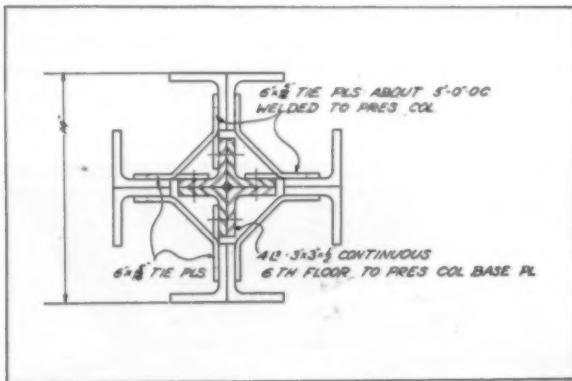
Plan of a Gray-Type Column Made of Four Shapes, Showing Method of Reinforcing by Welding
